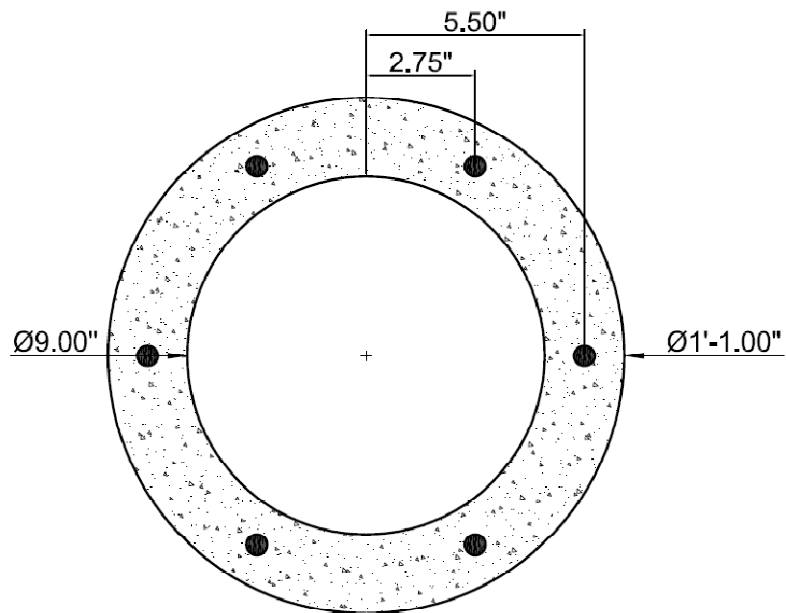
An Illustration Showing the Cross Section of the UHPC Horizontal Brace 13x2 in. (330x50.8 mm) with 6-0.6 in. (15mm) Strands
